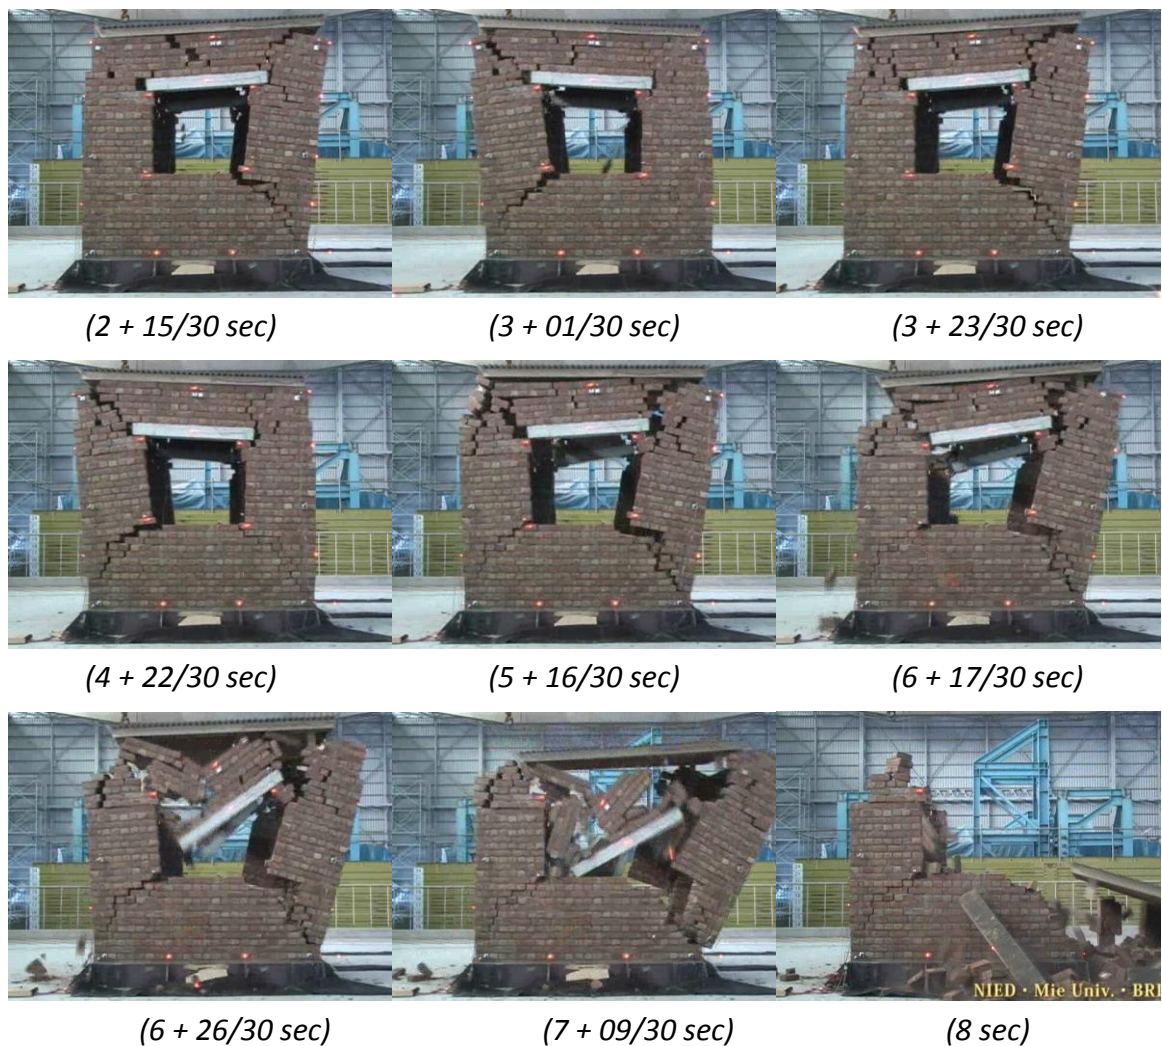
Sequence of Collapse of One Brick Thick Masonry Walls Construction due to 1995JMA KOBE NS100cm/s (110%) (Narafu, 2010)
